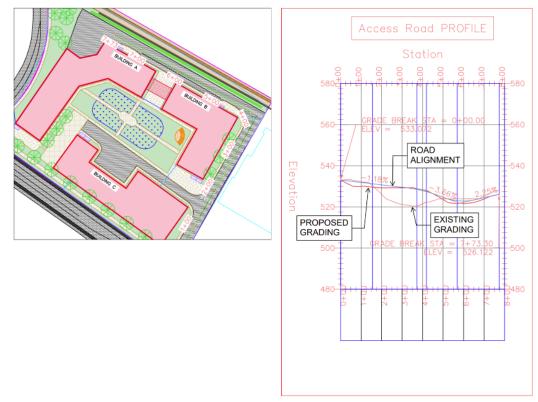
Road profile for the access road at Ivy Corridor Phase II. Shown to the left is the access road alignment with stations marked, and shown to the right is the profile.
